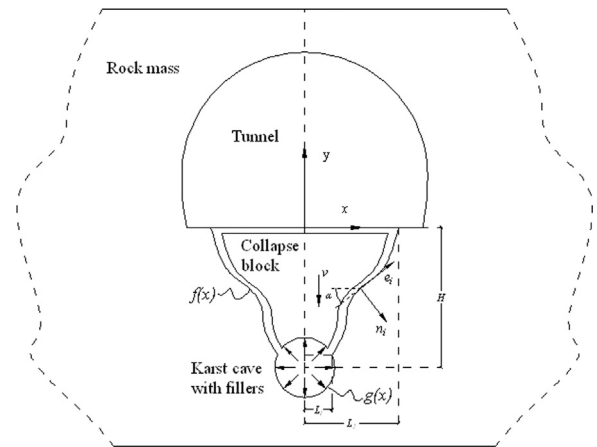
Rock mass failure mechanism of a karst cave beneath a tunnel.
